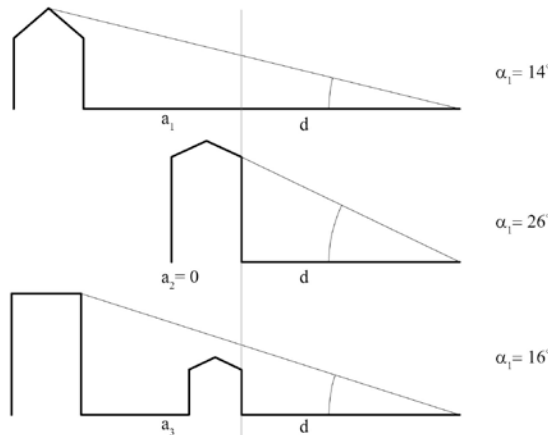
Corrugation of the wall, a_n - set back or behind of a part of a wall, d – a distance of the wall from the central point of the cross-section.
